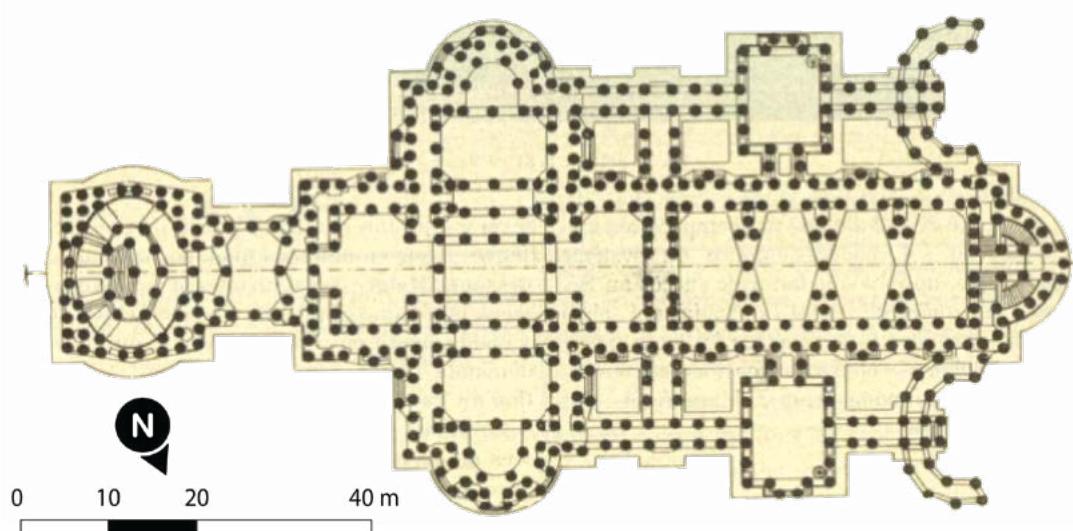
Foundation plan of the Ananta Samakhom Throne Hall, as published in *Le Béton armé* © Gallotti 1910: 67 (Adapted)
